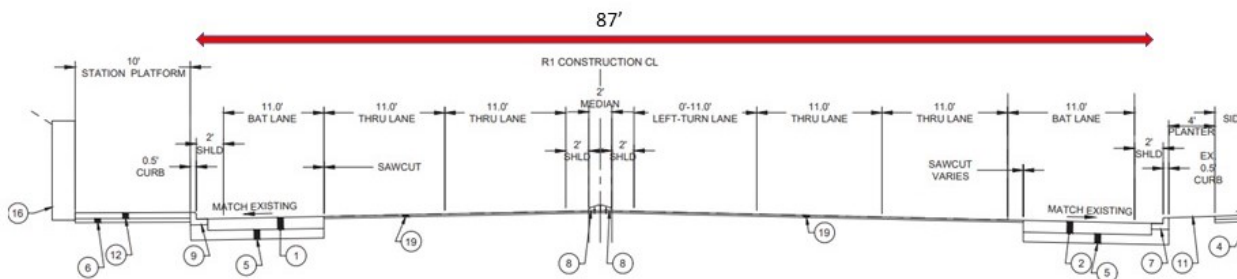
(Sheet 086) Proposed pavement cross-section for 6 traffic lanes and a left-turn lane
